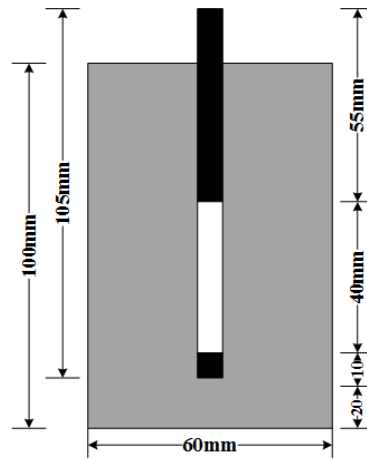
Cylindrical reinforced concrete specimen for Stage-III
